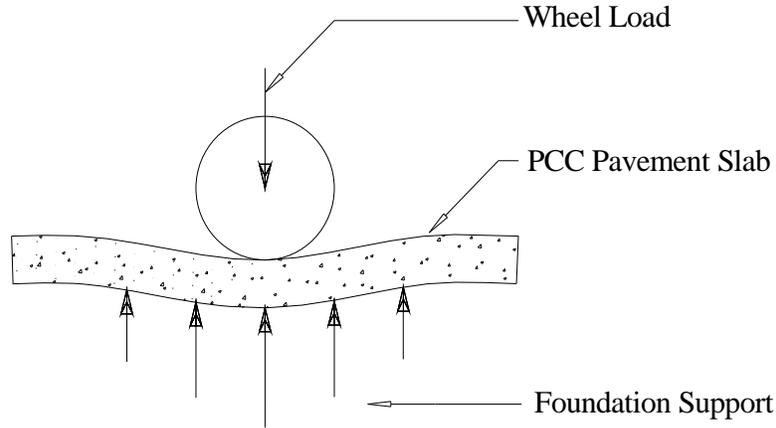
2. Transfer of Wheel Load to Foundation in Rigid Pavement Structure
